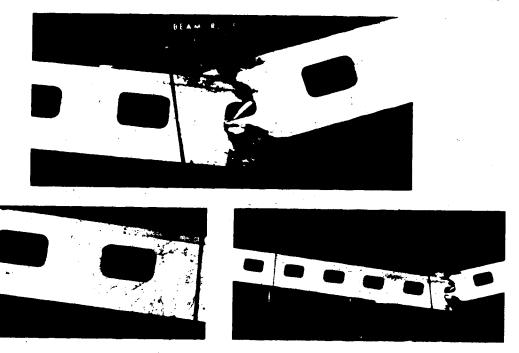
CRACKING AND FAILURE PATTERN OF BEAM 15-12-6
